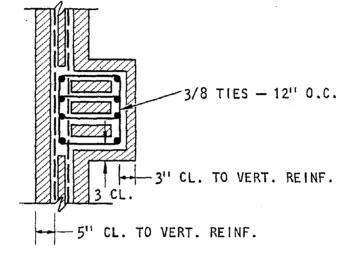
TYPICAL DETAIL OF INTERIOR BRICK WALL COLUMN (AS BUILT, 1954)
